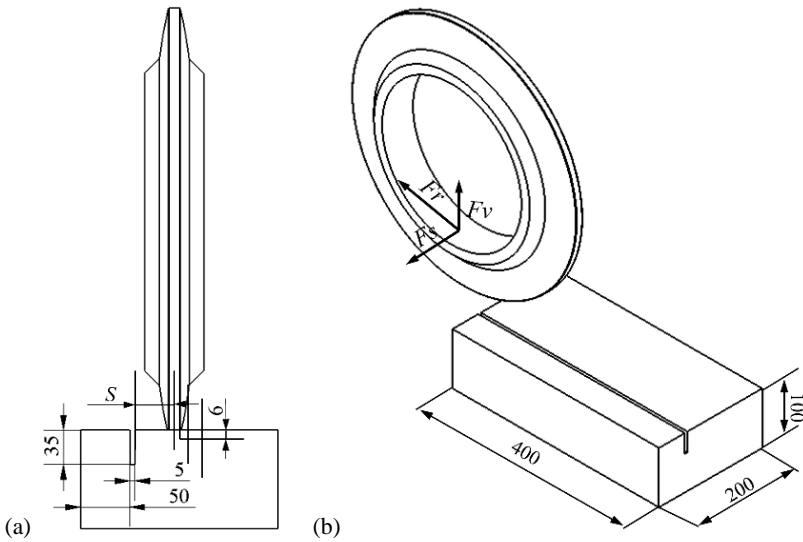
Hob linear cutting rock model: (a) front view; (b) three-dimensional view
